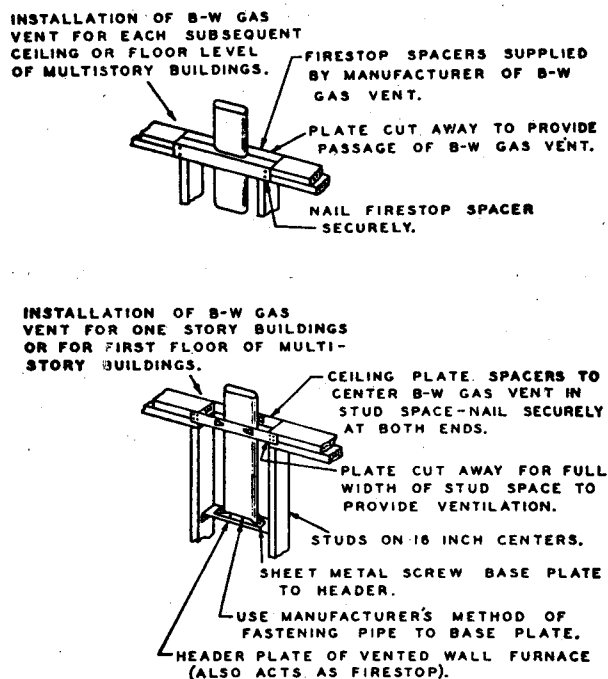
Installation of Type B-W Gas vents for Vented Wall Furnaces.
